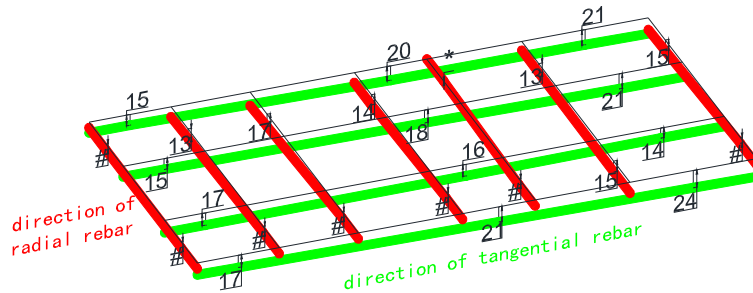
3D diagram of concrete cover in testing zone 5 [mm].
